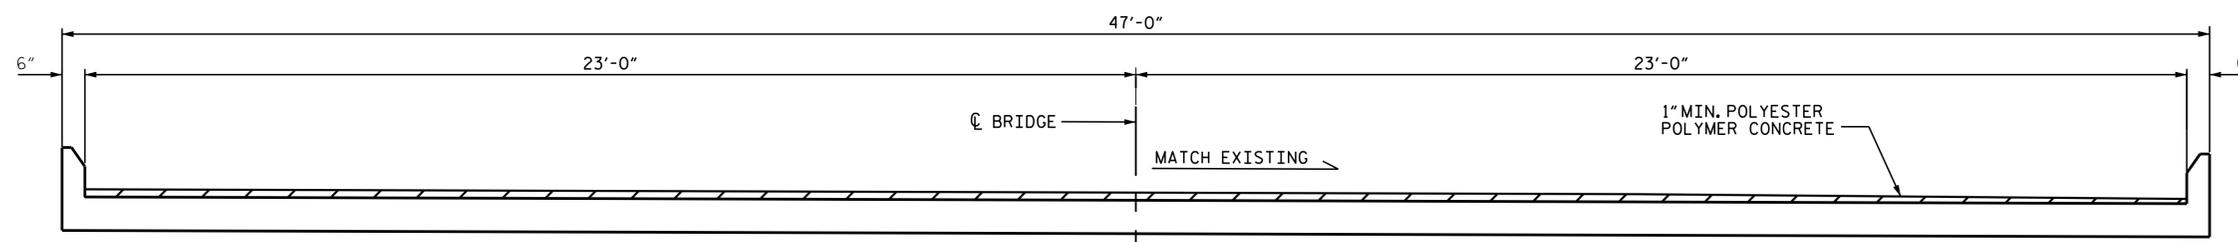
DETAIL FOR POLYESTER POLYMER CONCRETE OVERLAY
